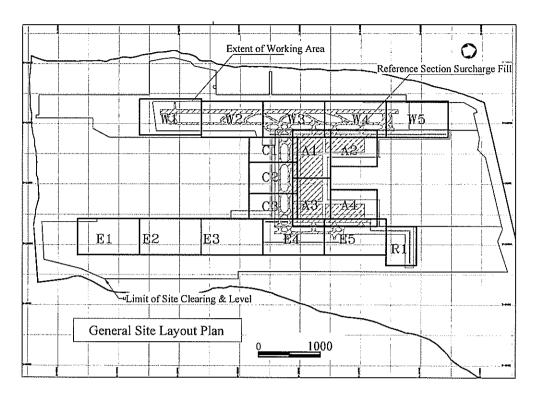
Layout plan of ground improvement work for Airside Pavements, SBIA
